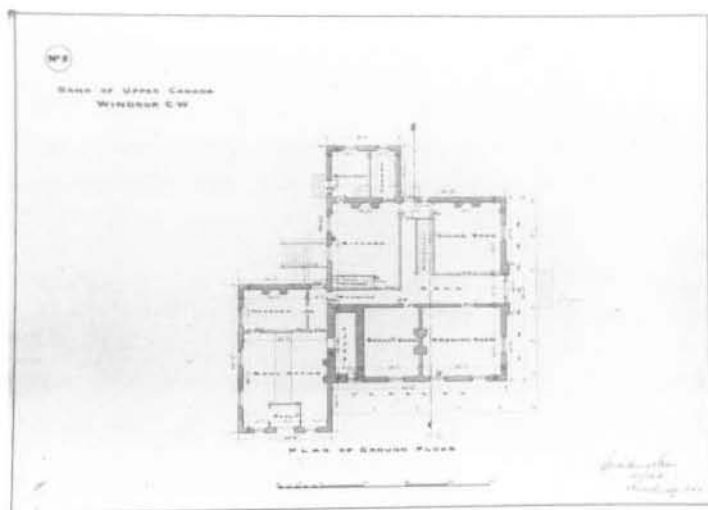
Cumberland & Storm, Bank of Upper Canada, Windsor, 1855, ground plan, Horwood Collection, Ontario Archives (99) 2. (Photo: Ontario Archives, Toronto)
